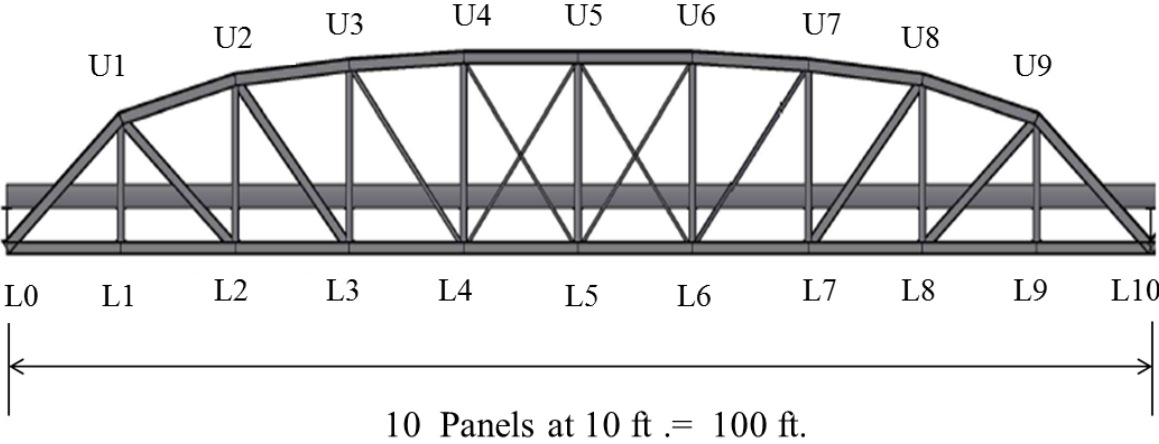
Bridge Elevation (Fernstrom et al., 2012).
